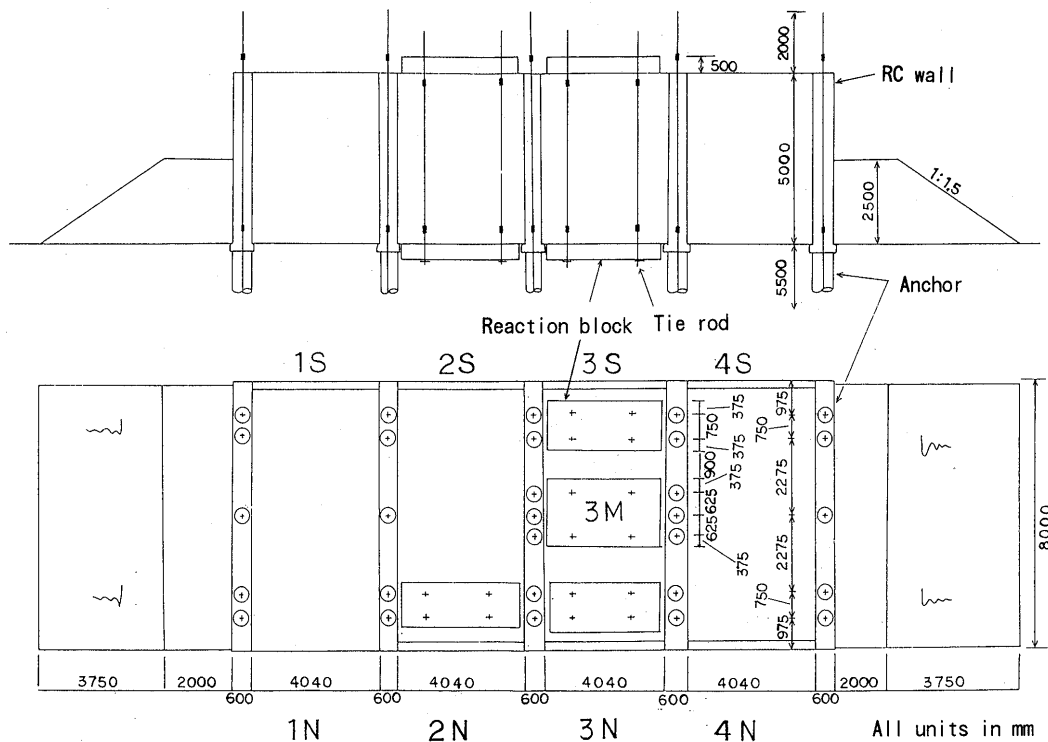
a) Longitudinal vertical cross-section, b) Plan of full-scale test walls constructed at Chiba Experiment Station, IIS, University of Tokyo
